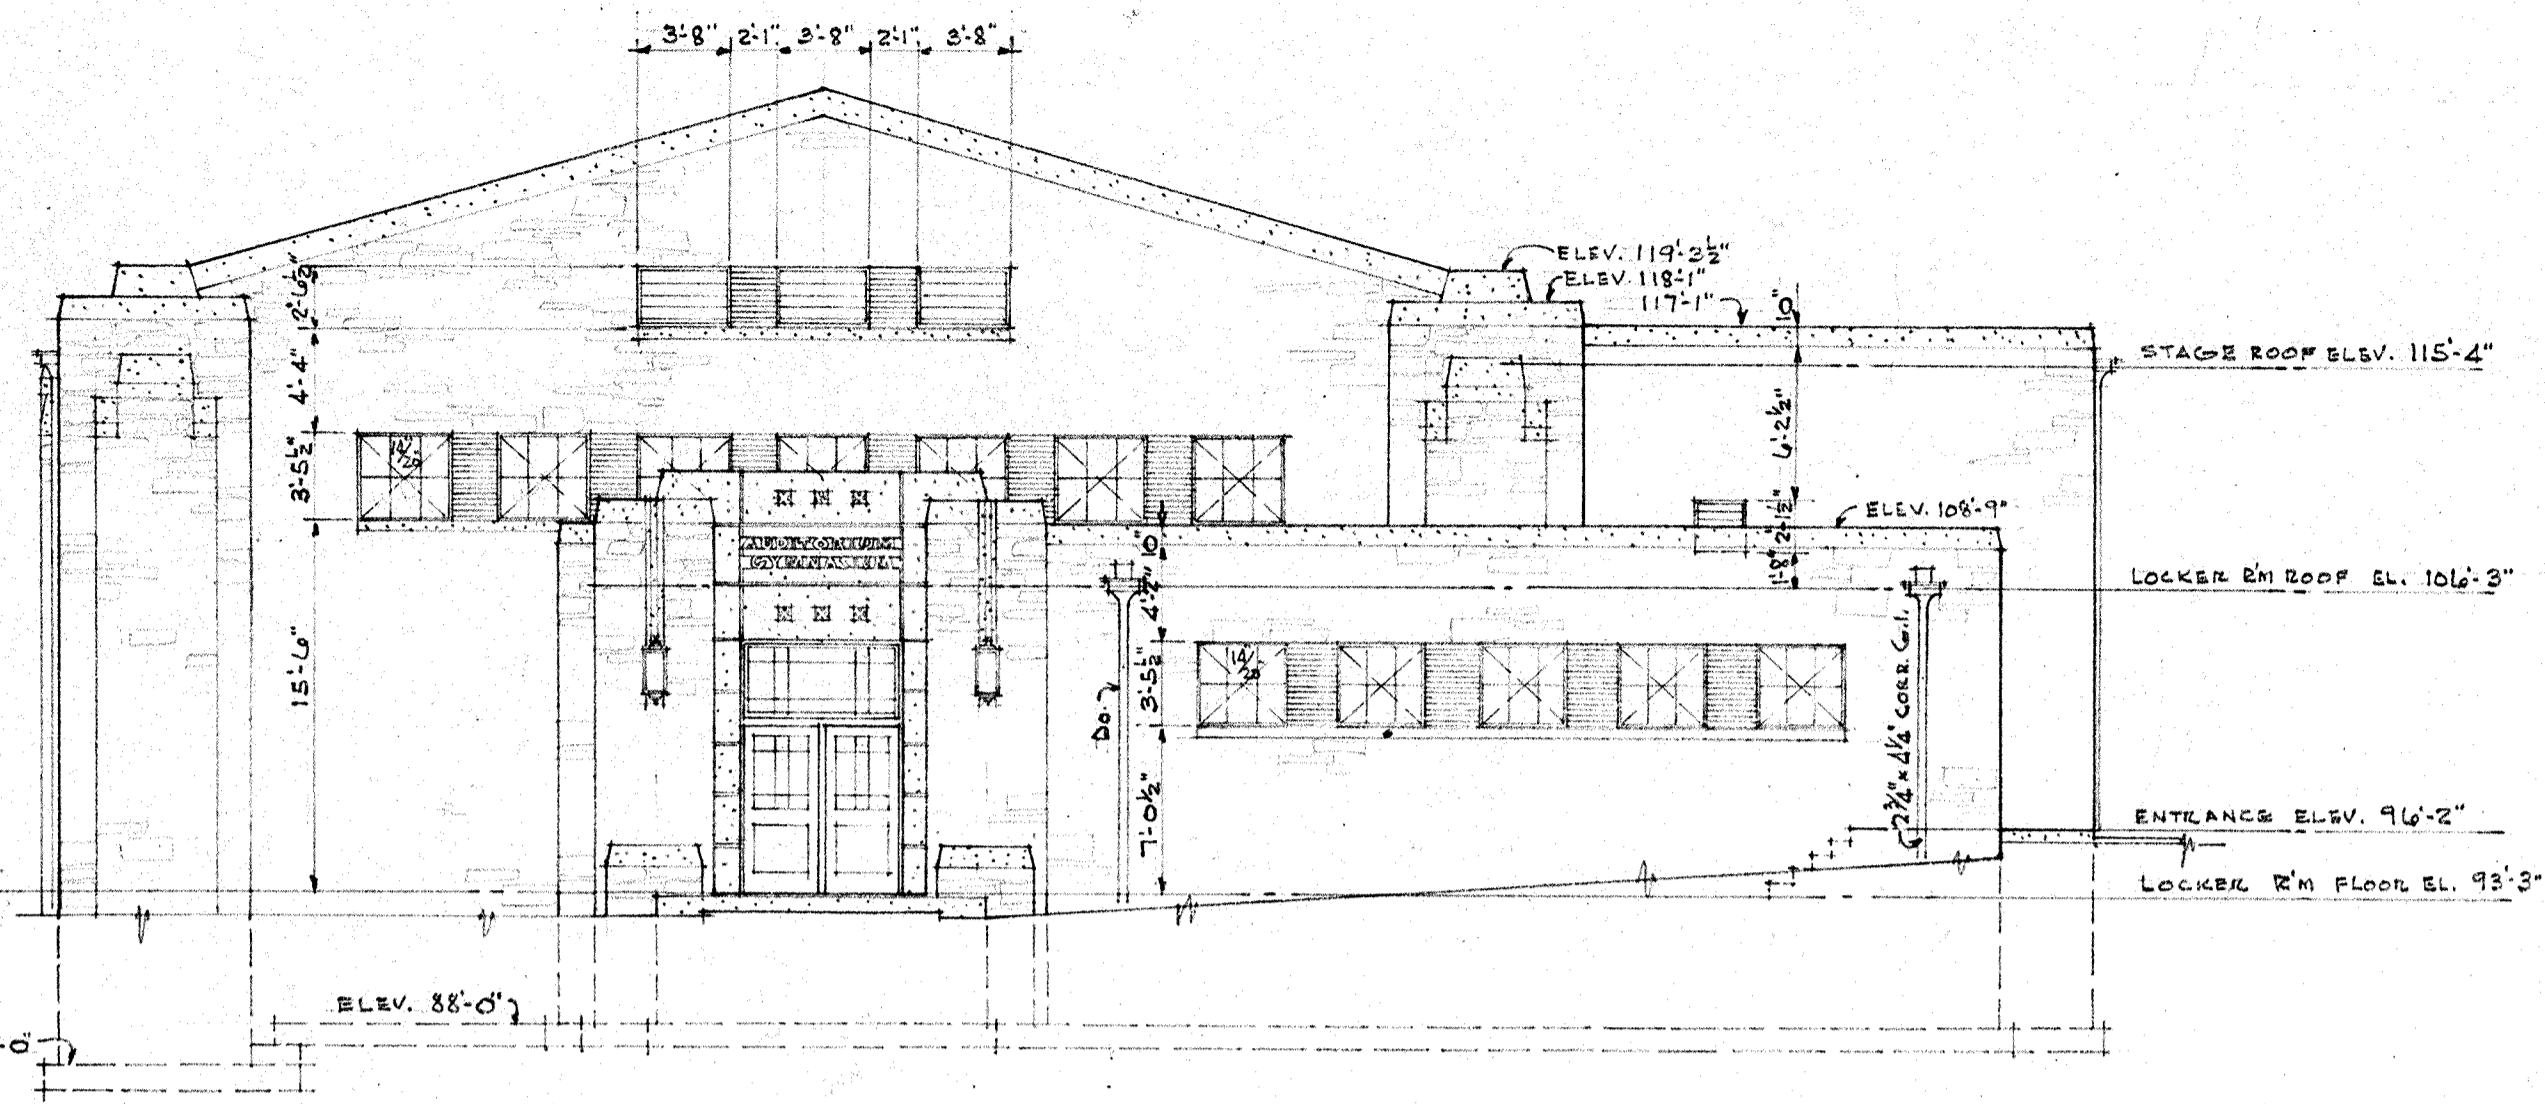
/16 SCALE 3/8" = 1'-0"
